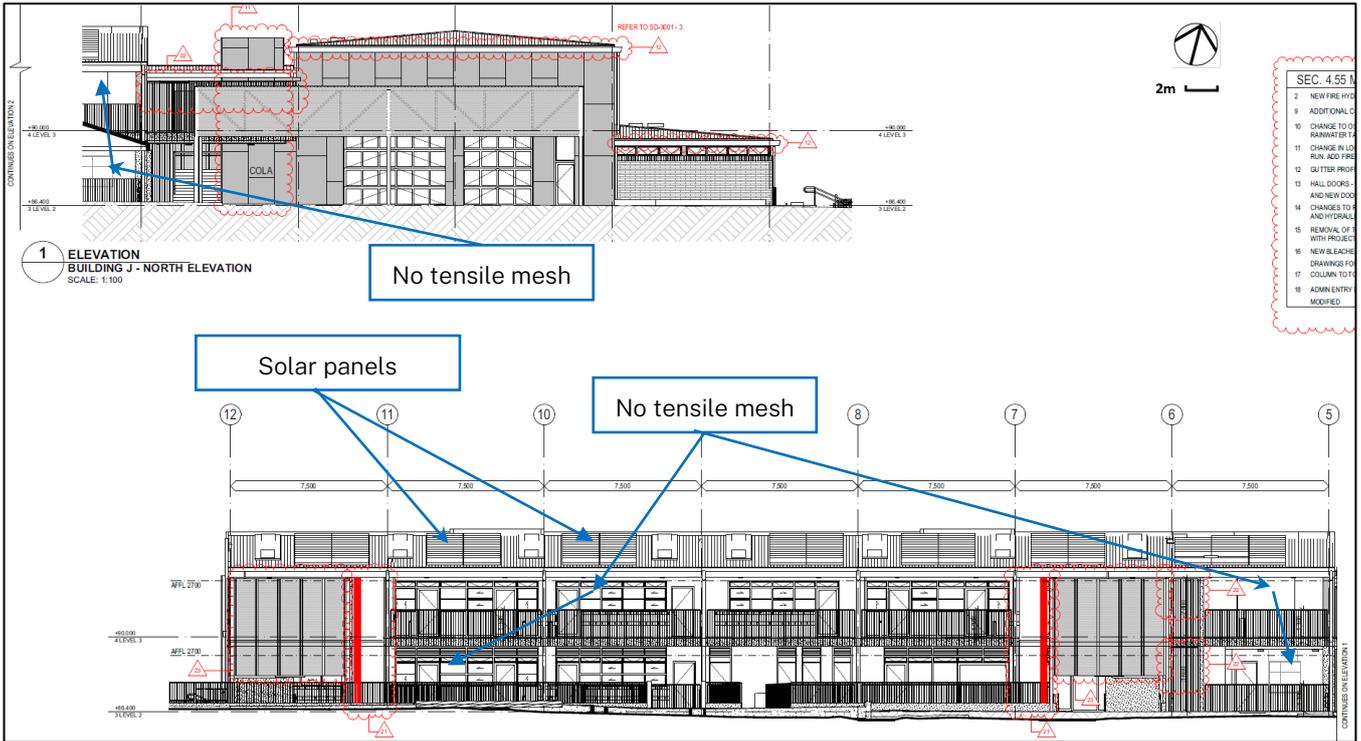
| Approved North Elevation of Building I and J (Source: Modification 3, 2023)
